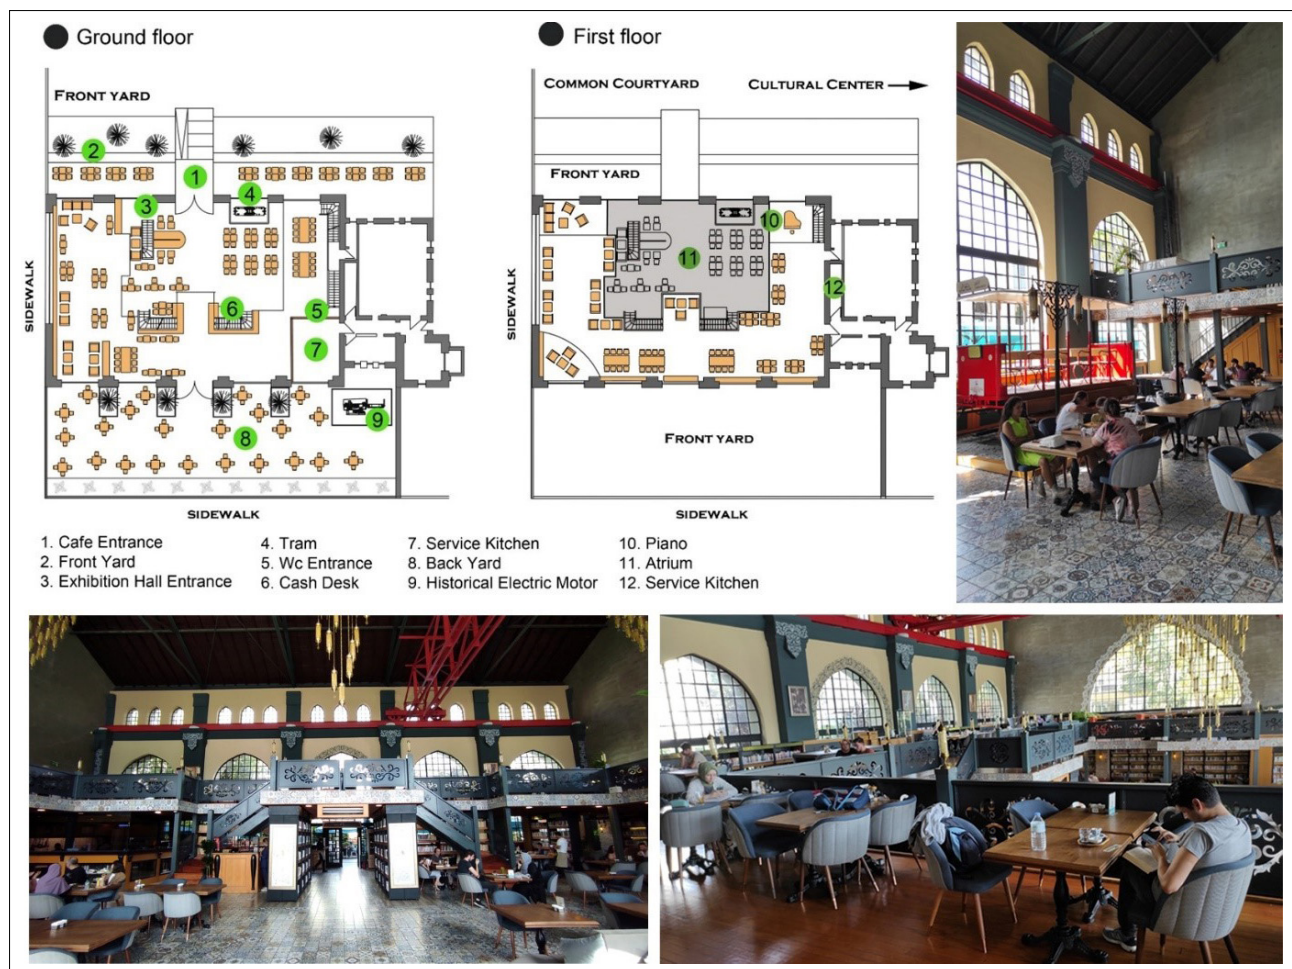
Nevmekan Bağlarbaşı Book Cafe Ground Floor and First Floor Plans and interior views.
